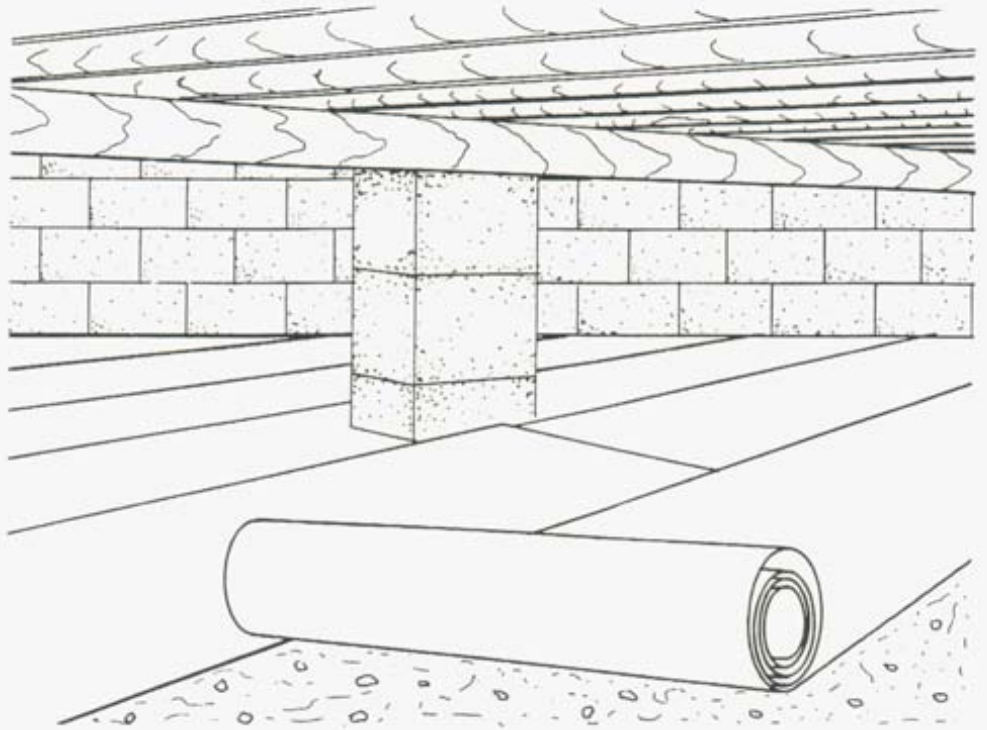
Roll roofing used to cover the soil under a house. Such a cover keeps the soil moisture from vaporizing into the air and then condensing on the sills and joists. Where roll roofing is used, the crawl-space ventilators, or most of them, can be safely closed during the winter.
